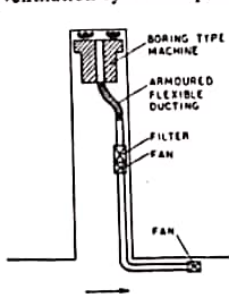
Exhaust ventilation of a face worked by a boring-type machine.
